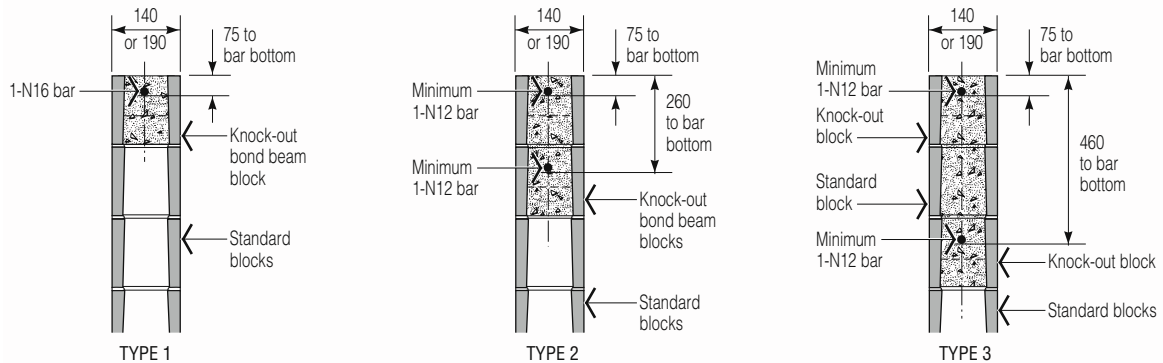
Typical Details for Bond Beams Supporting a Roof
